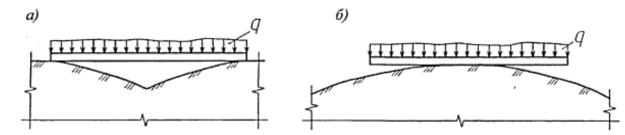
Design diagram of a strip foundation for cases of swelling of foundation soils under the end sections (a) and under the center (b)
